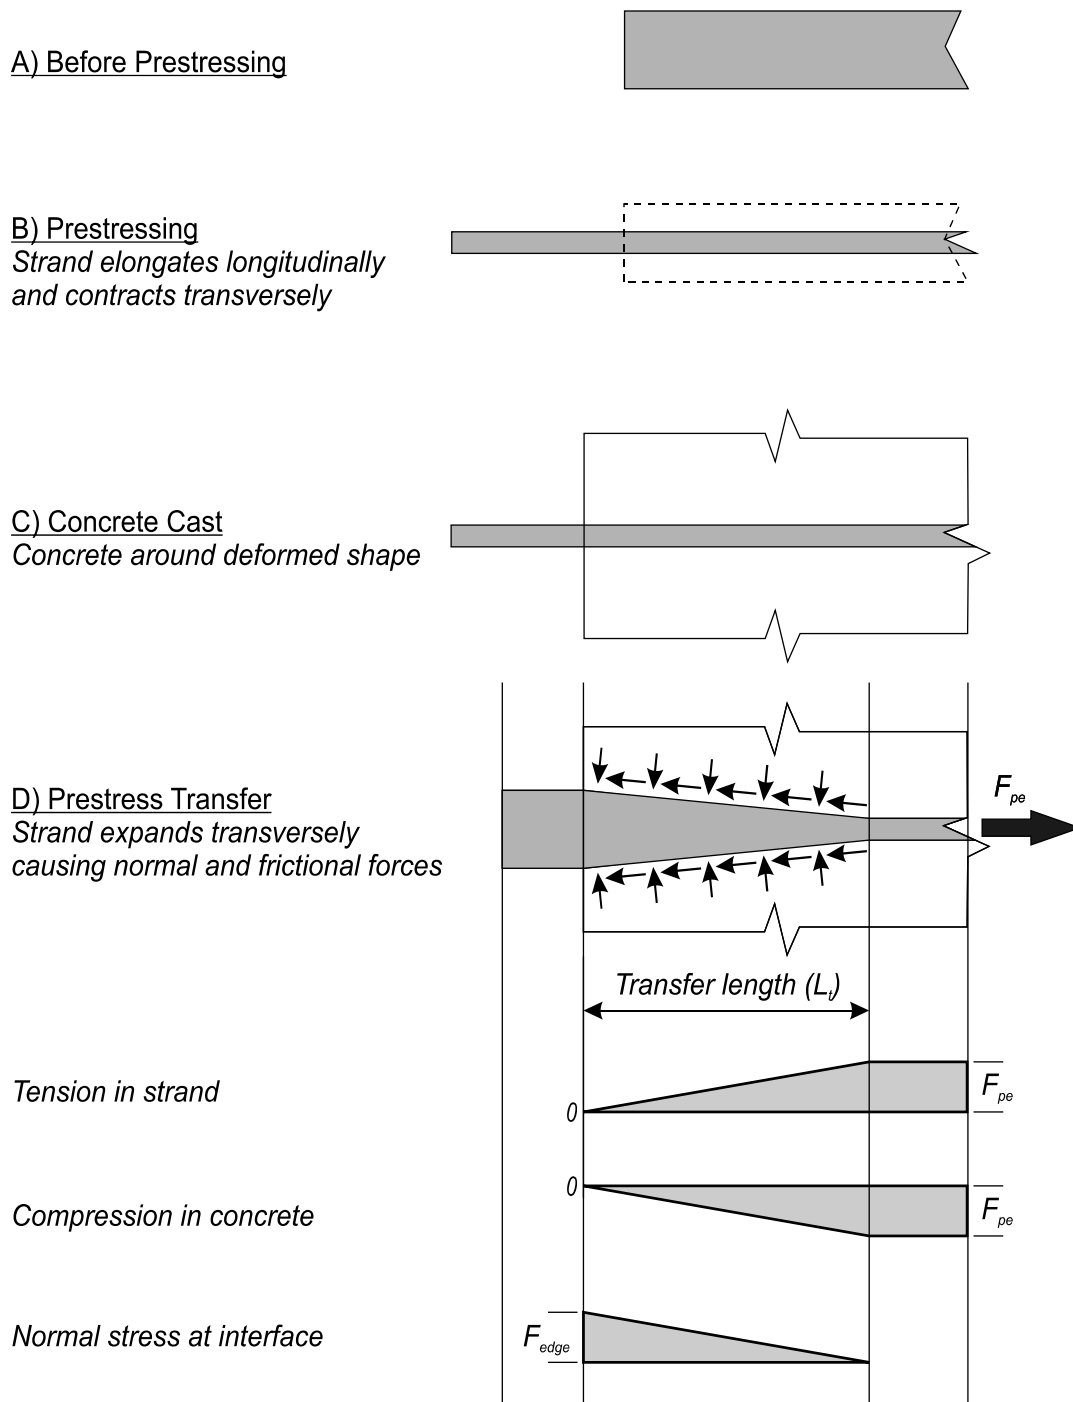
Hoyer effect A) strand before stressing, B) strand after prestressing, C) concrete cast around strand, and D) stresses and forces after transfer
